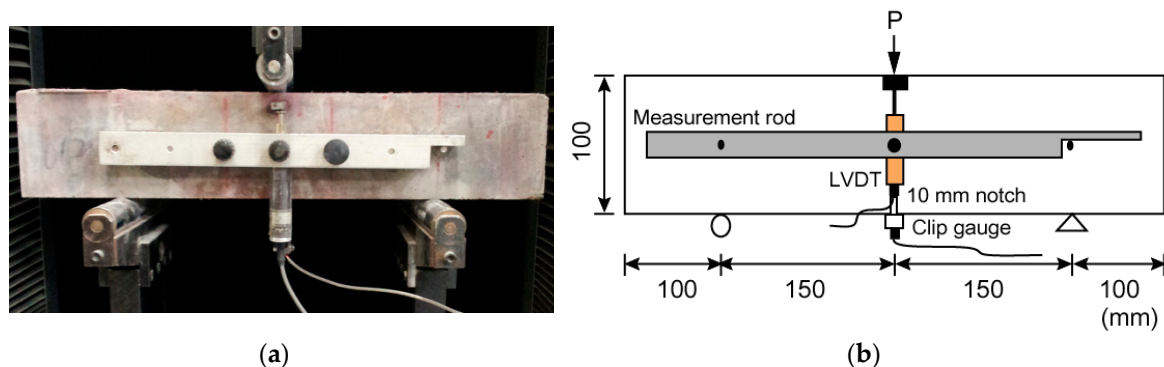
Set-up of three-point bending test with notched beam. (a) Test setup; (b) Dimensions.
